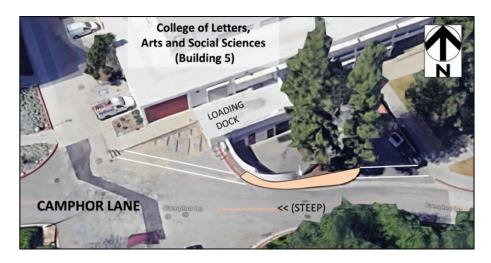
Camphor Lane behind Building 5 – sidewalk gap closure concept
